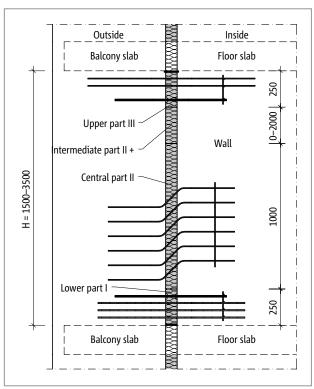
Schöck Isokorb® T type W: Layout; Balcony structure with thermally insulated load-bearing shear walls
